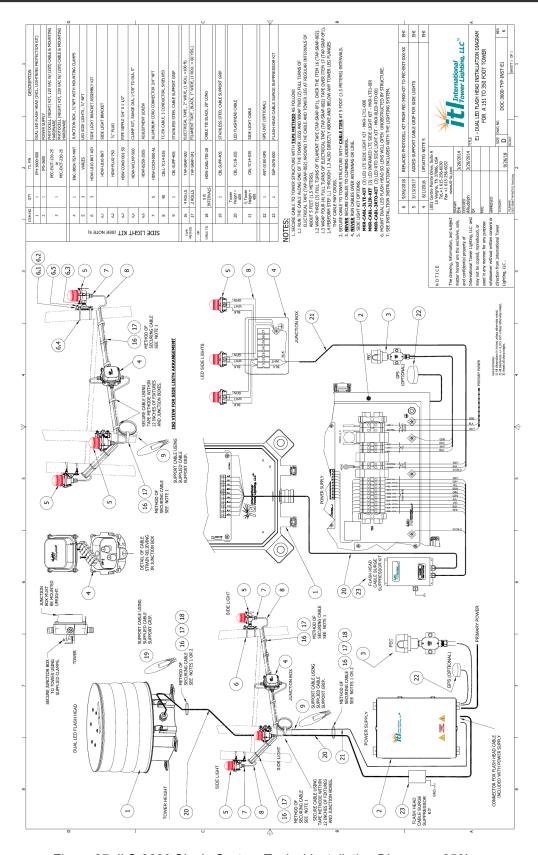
ILS-3600 Single System Typical Installation Diagram – 350'
